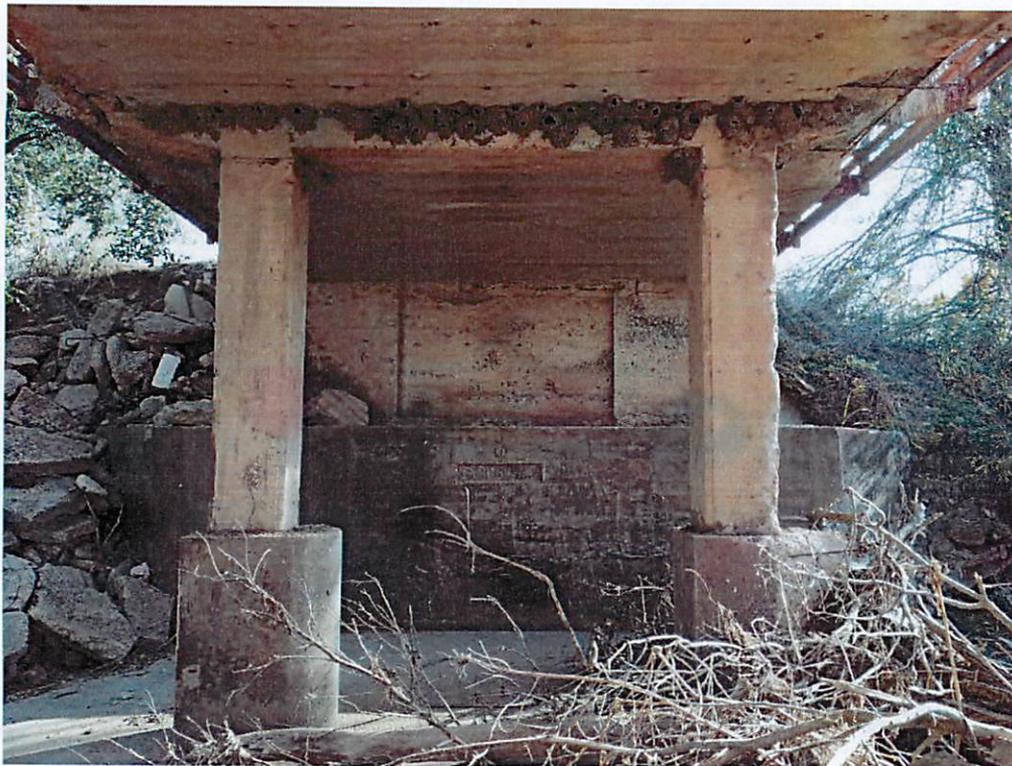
looking at the south abutment and retaining wall with POW embossed impression.
